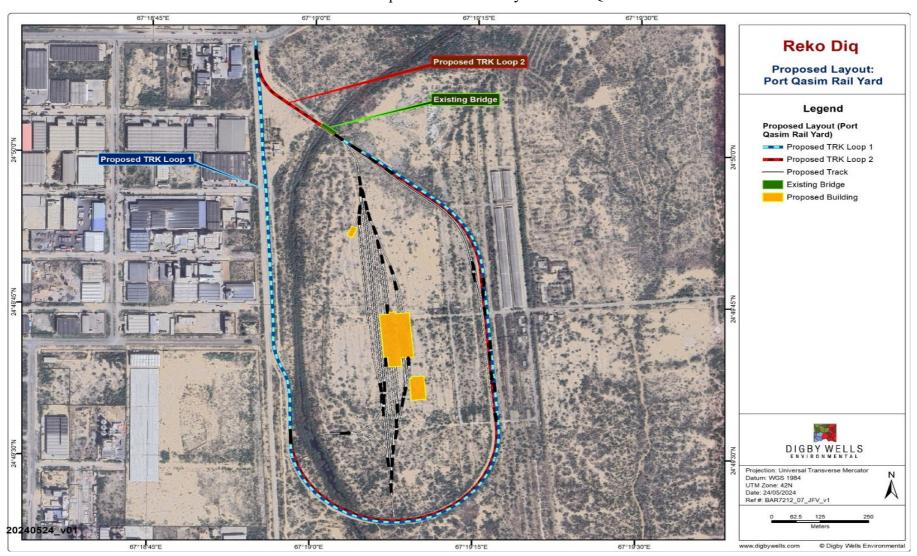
Proposed Rail Yard Layout at Port Qasim
